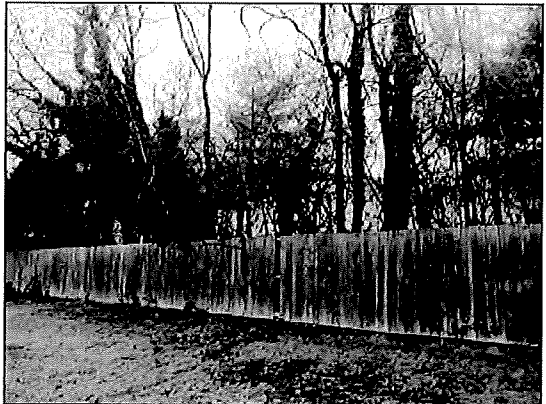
Wood stockade fence will need renovation if it is to be kept in service.
